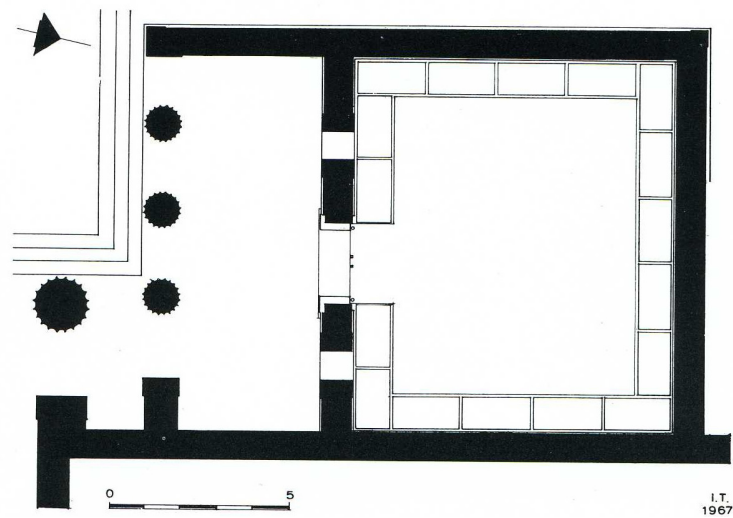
Plan of the Pinakothke with suggested layout of couches
